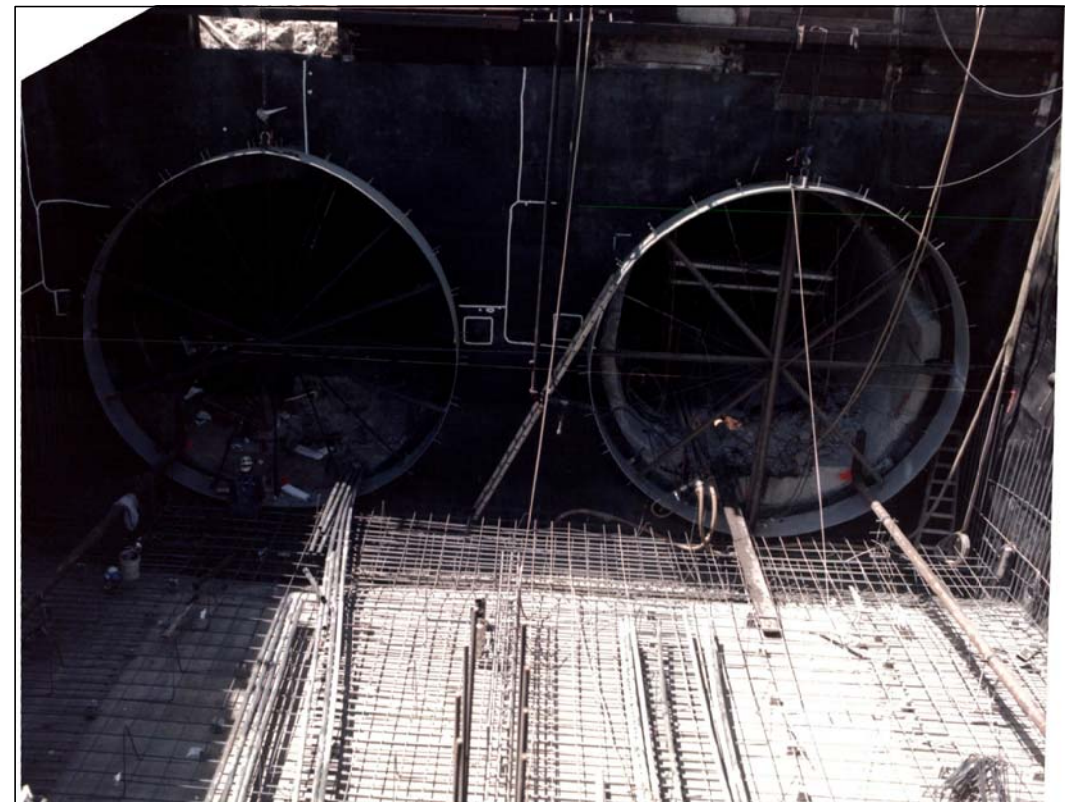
Reinforcement steel being placed in the closing slab of box structure at the south tunnel portals. Photo taken: 07/30/90. Source: SCRTRD, 1990a.
